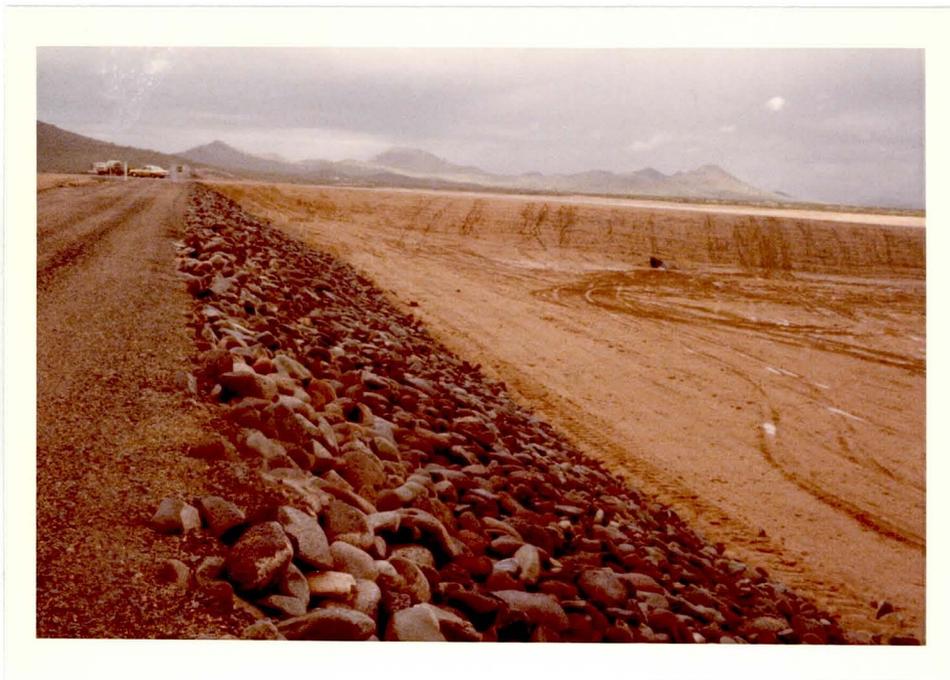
Dike No. 2, upstream slope looking west at Cave Creek Road.
